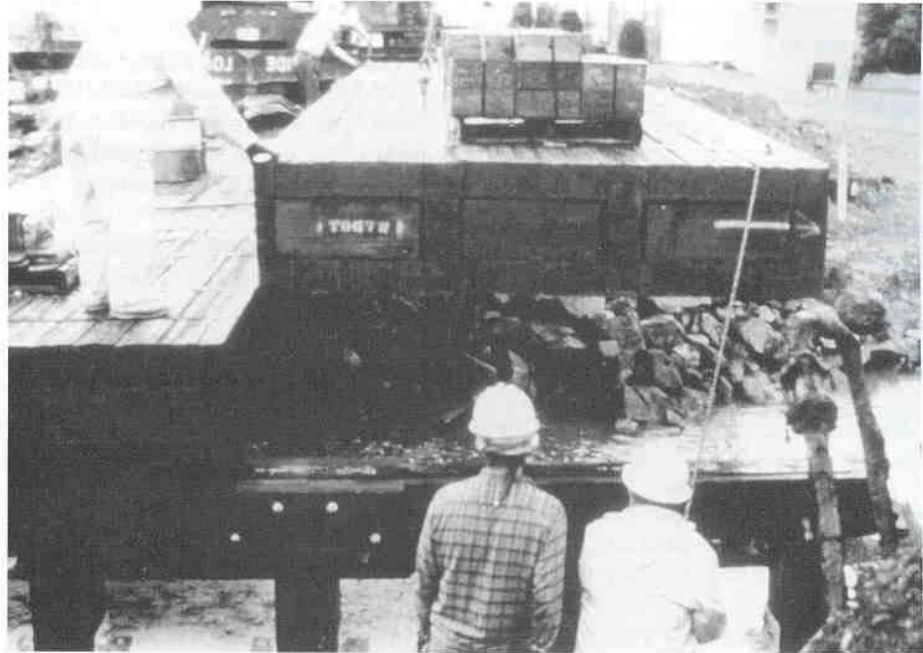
Coal-Tar Creosote Treated Timber Beams (Source: Barry Dickson, West Virginia University)
